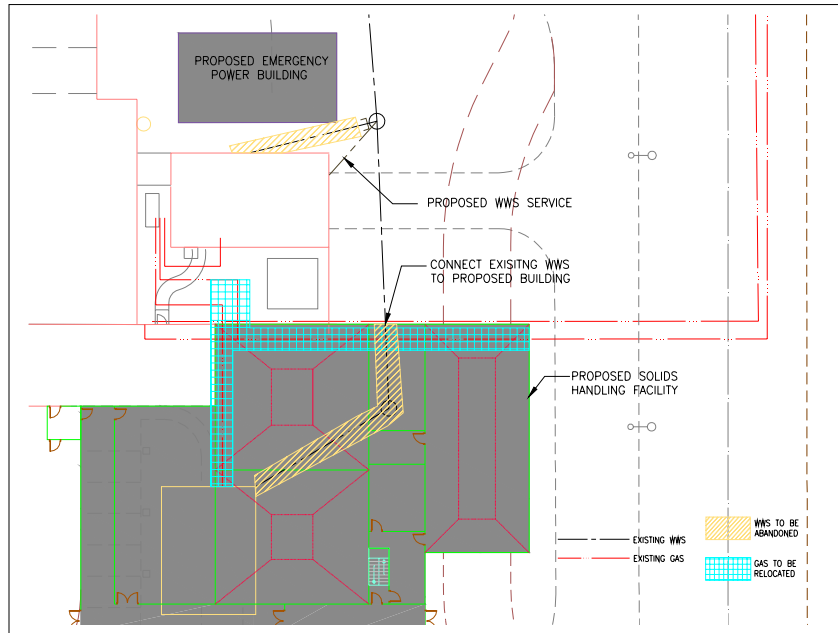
Existing Wastewater Sewer and Proposed Wastewater Sewer Realignment
